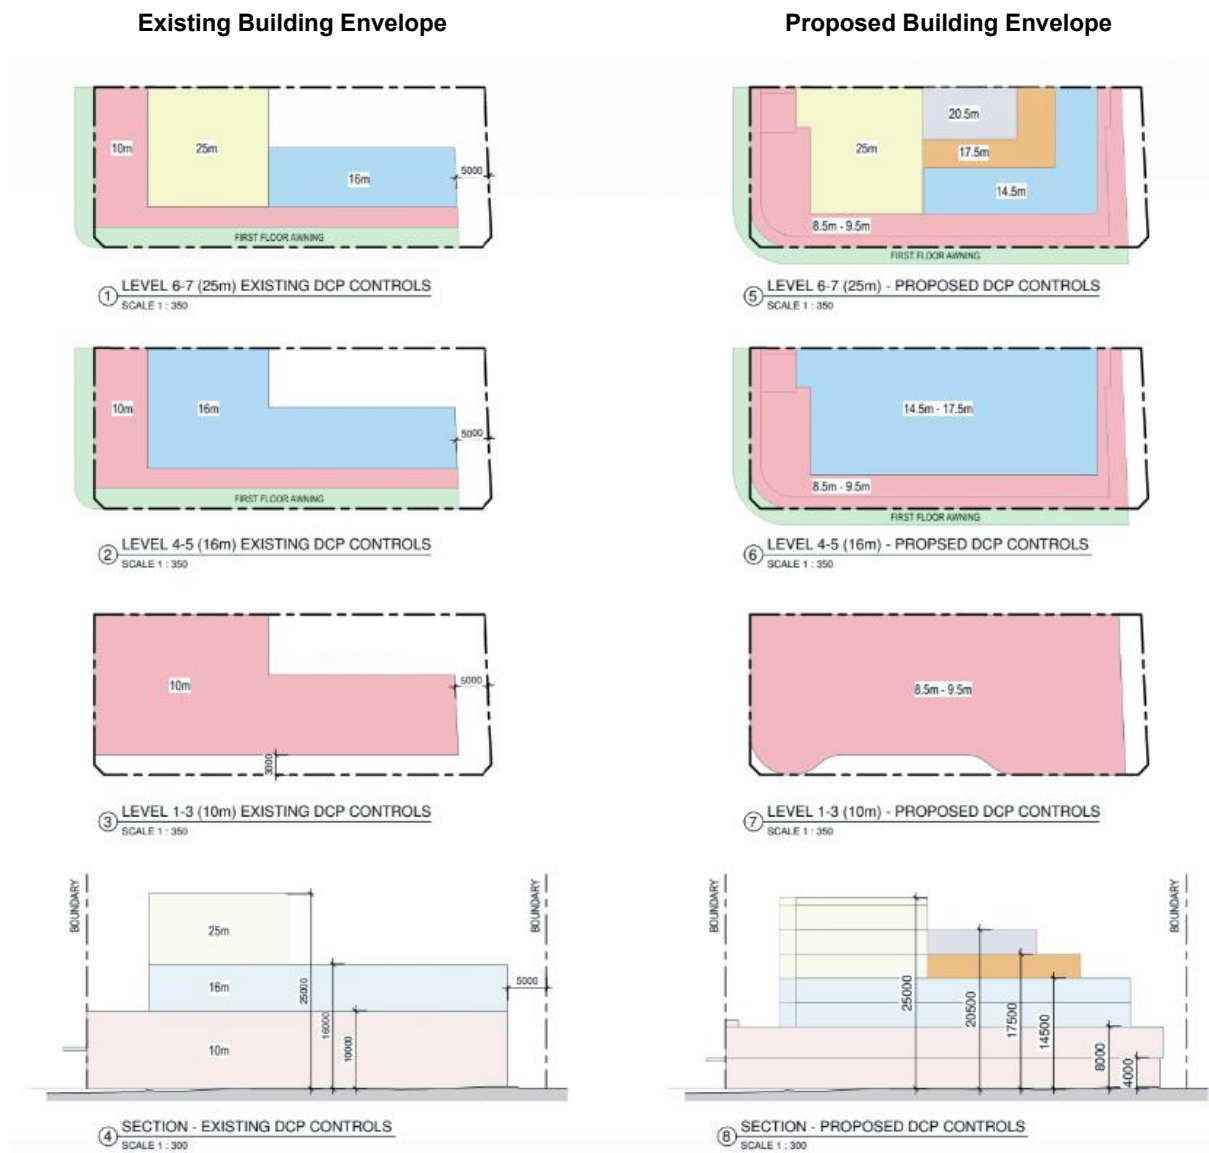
Existing and Proposed Building Envelope (source: Innovate Architects)
